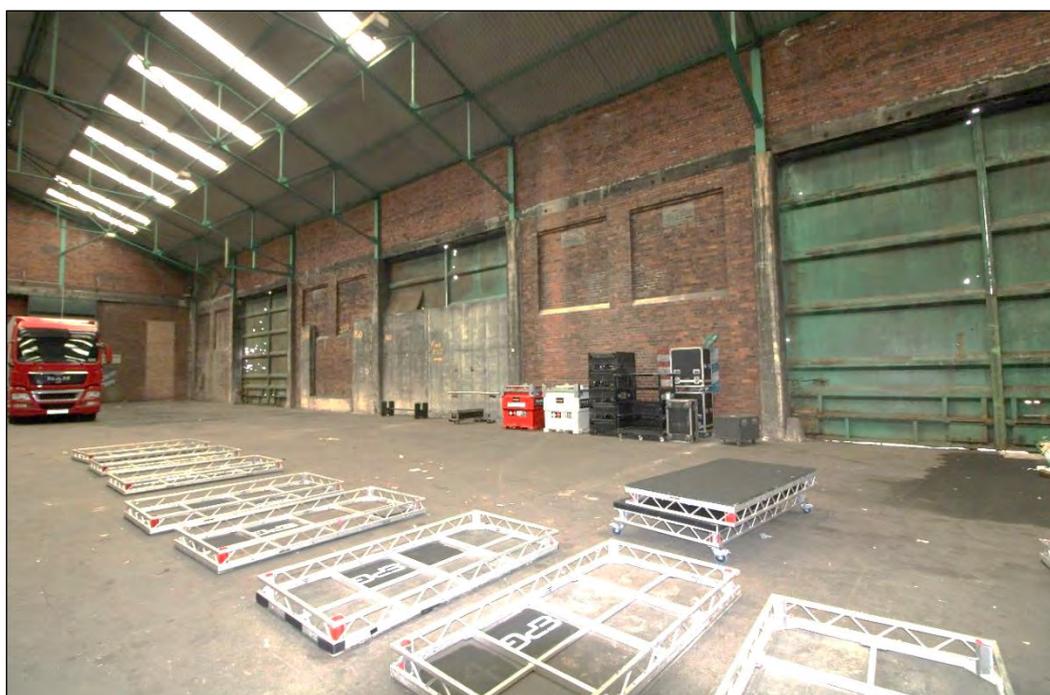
Northern wall of eastern shed, showing partially blocked loading door in bay 7
